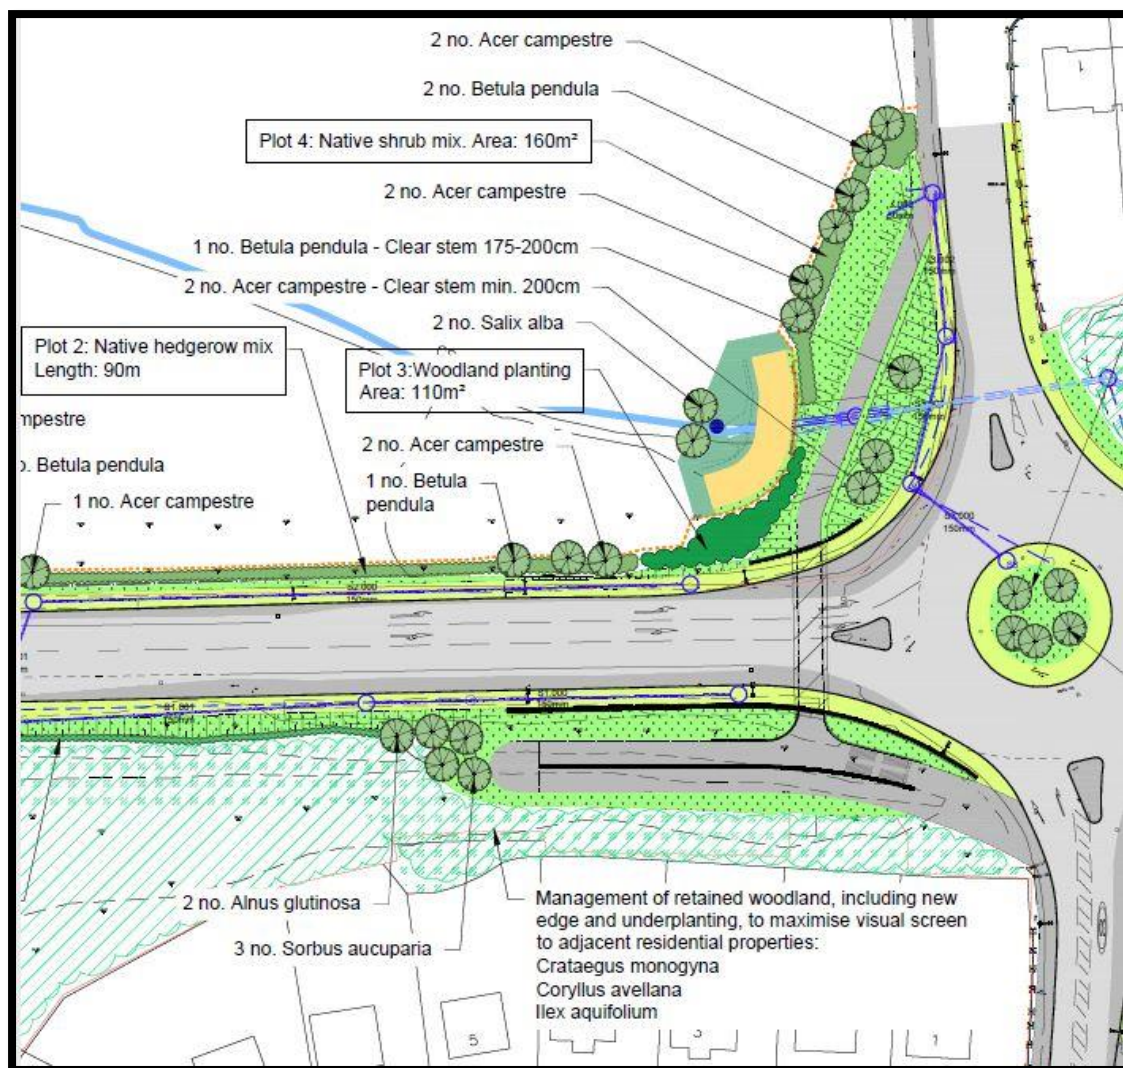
Proposed Planting around underpass (full plan reference: B23006DP/LAND/001 rev1)
